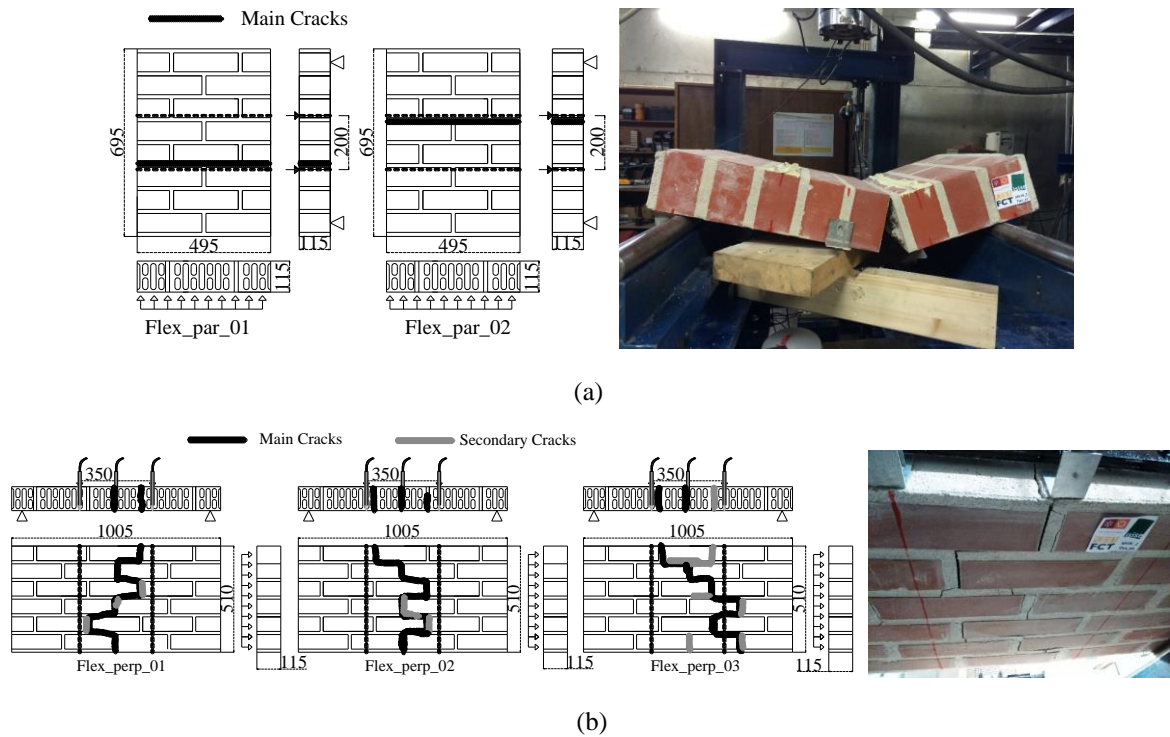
Failure modes: main and secondary cracks on wallets (a) whose plane of failure is parallel to the bed joints and (b) whose plane of failure is perpendicular to the bed joints
